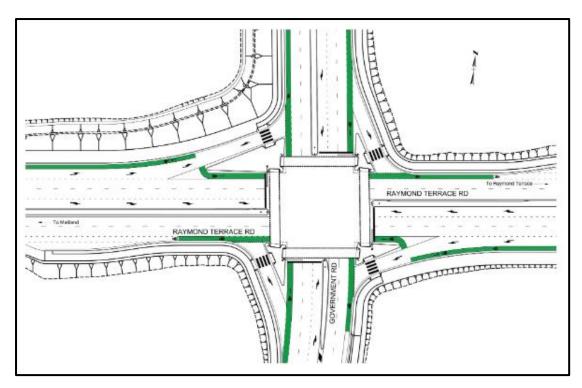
Schematic of intersection upgrade to Raymond Terrace Road and Government Road
